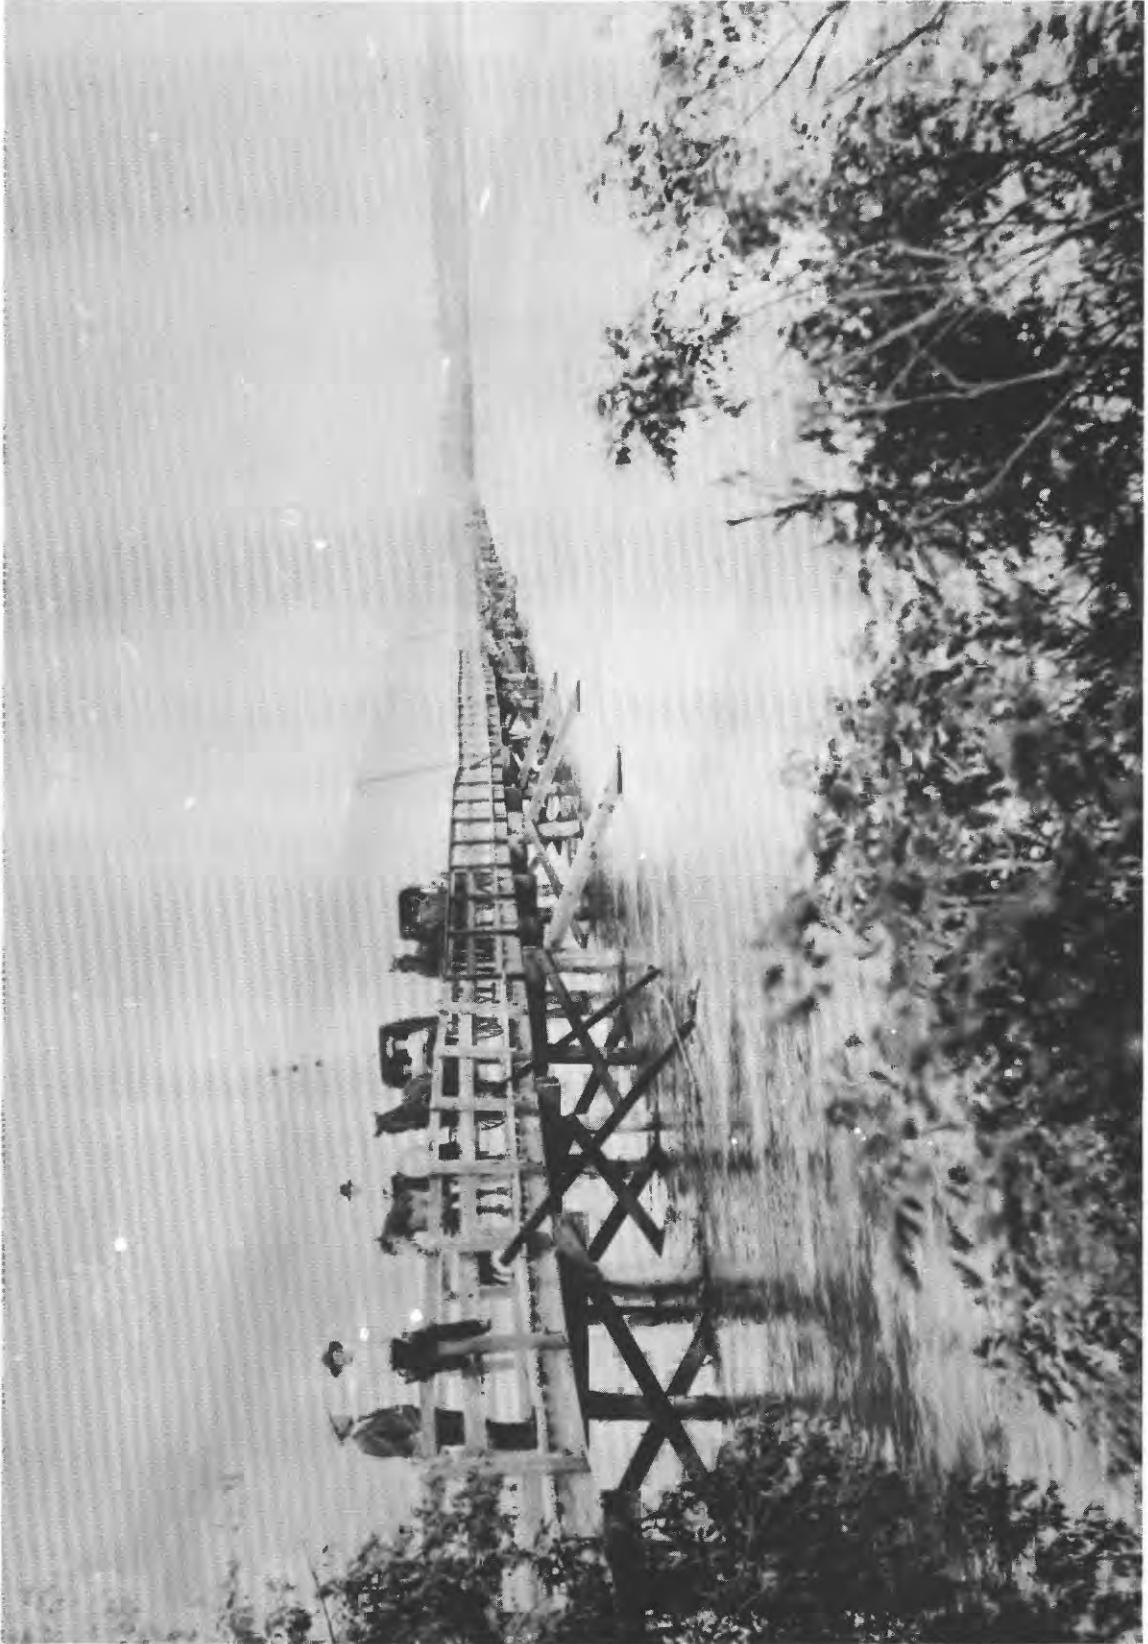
Platte River bridge about 8 km southeast of Grand Island (location of present U.S. Highway 34 bridge), looking southeast, about 1900. Photograph from the Stuhr Museum of the Prairie Pioneer.
